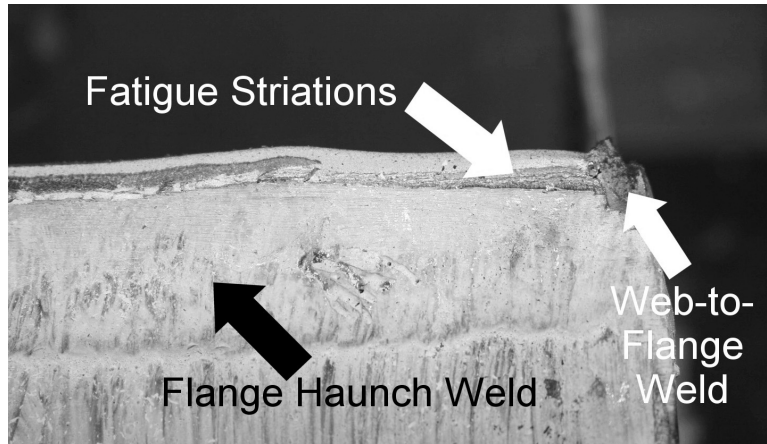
Bottom West Flange Fracture Surface and Fatigue Striations
